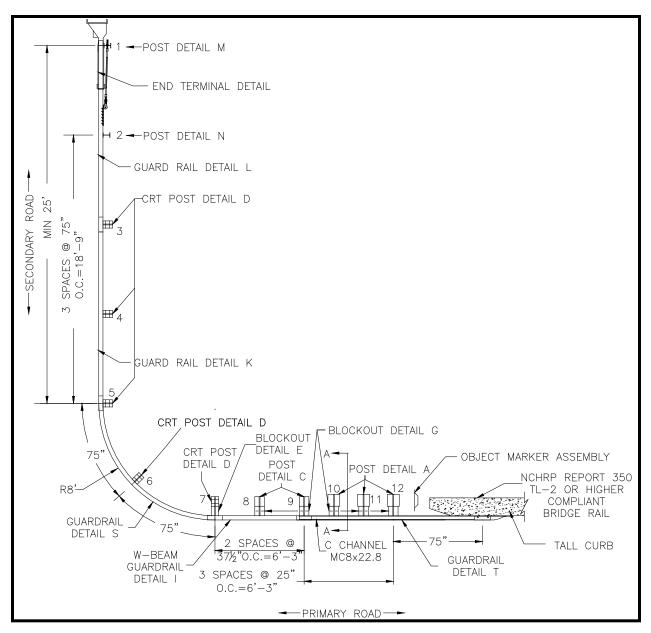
Recommended NCHRP Report 350 TL-2 T-Intersection System (16).
